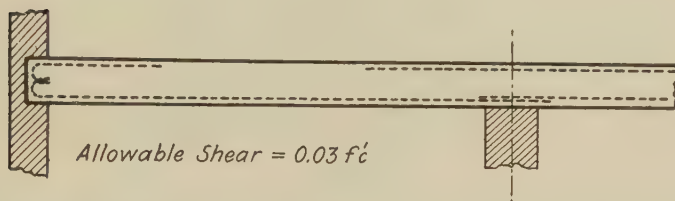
Typical Reinforced Concrete Beam; Special Anchorage of Longitudinal Bars.
